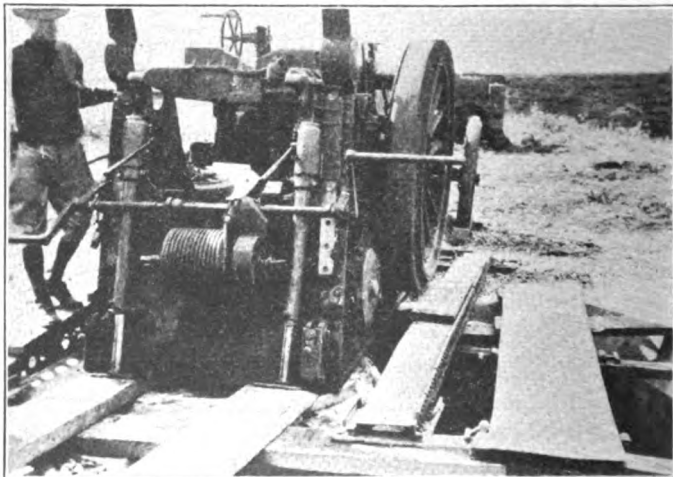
Jacking down cradle. Jacks and jack foot planks in place. Front wheels ready to be removed. Wheel mats in place
